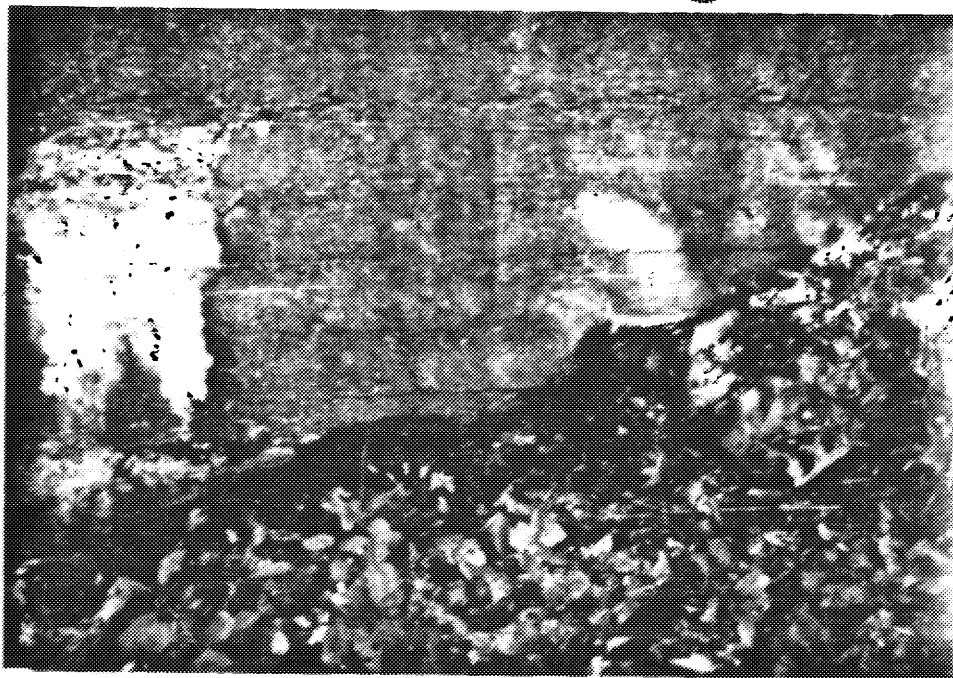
Seepage, efflorescence and cracking at downstream weir.
